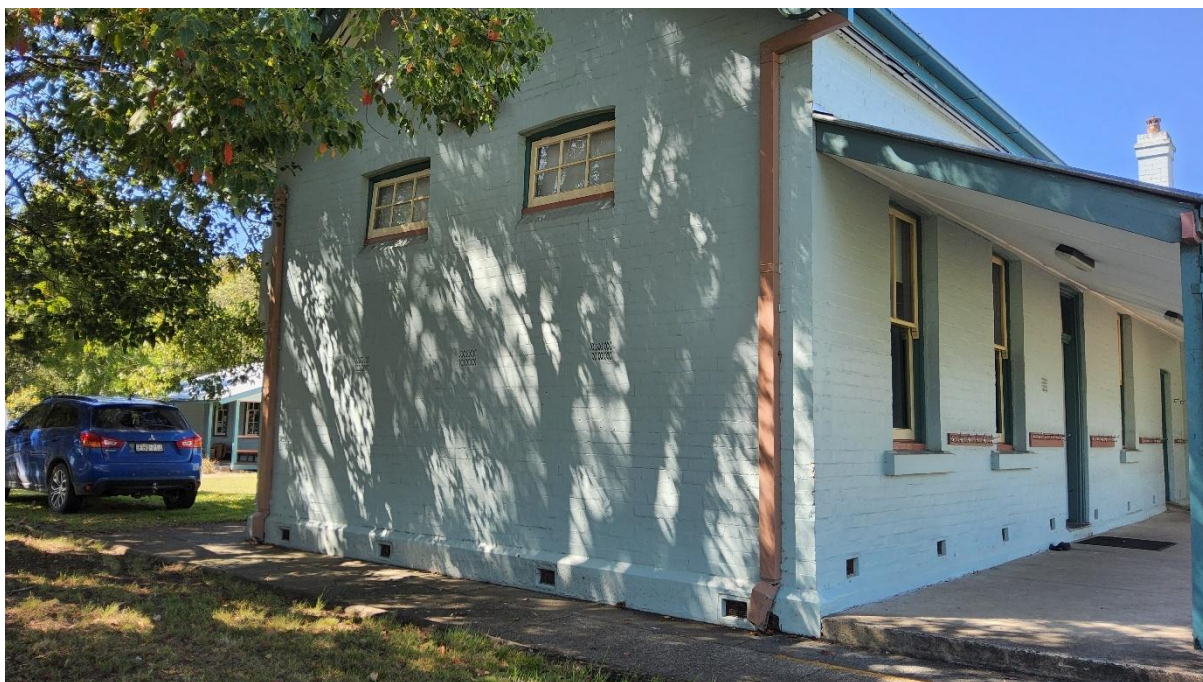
Eastern wing of Building E, constructed in English Garden Bond. (Source: Heritage Now 2025)
